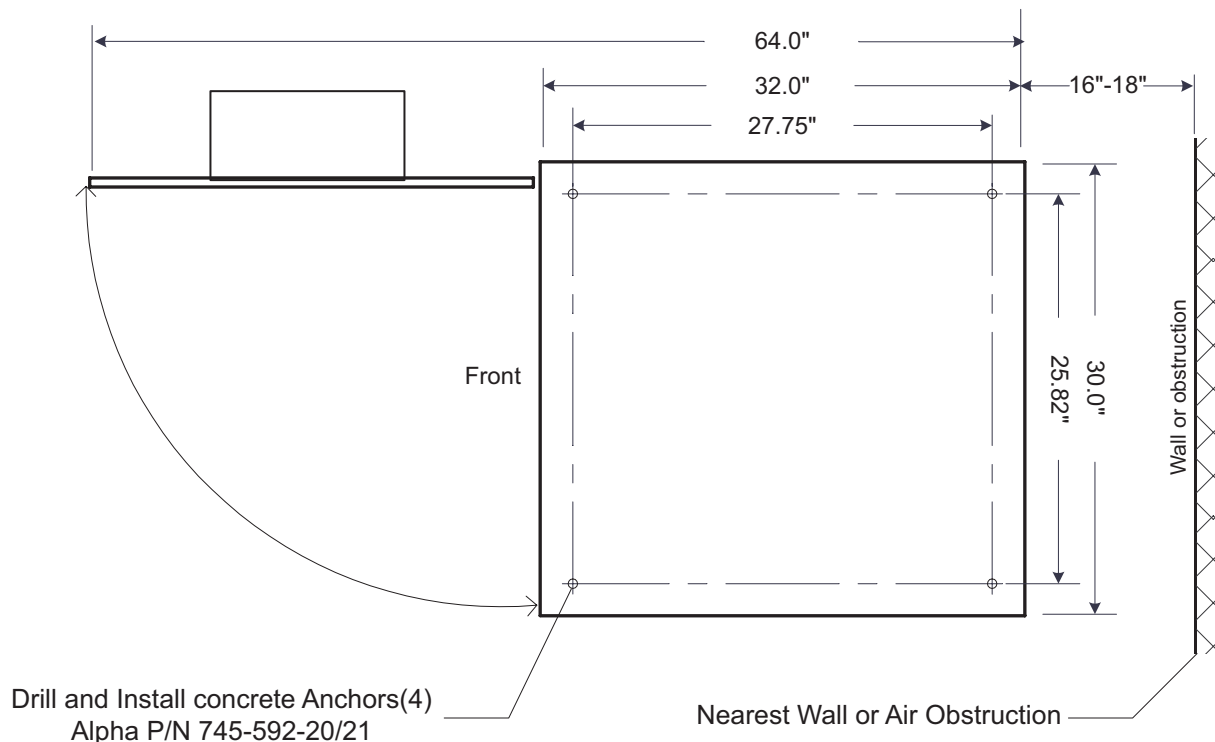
, Pre-existing Concrete Pad Layout (top view)
